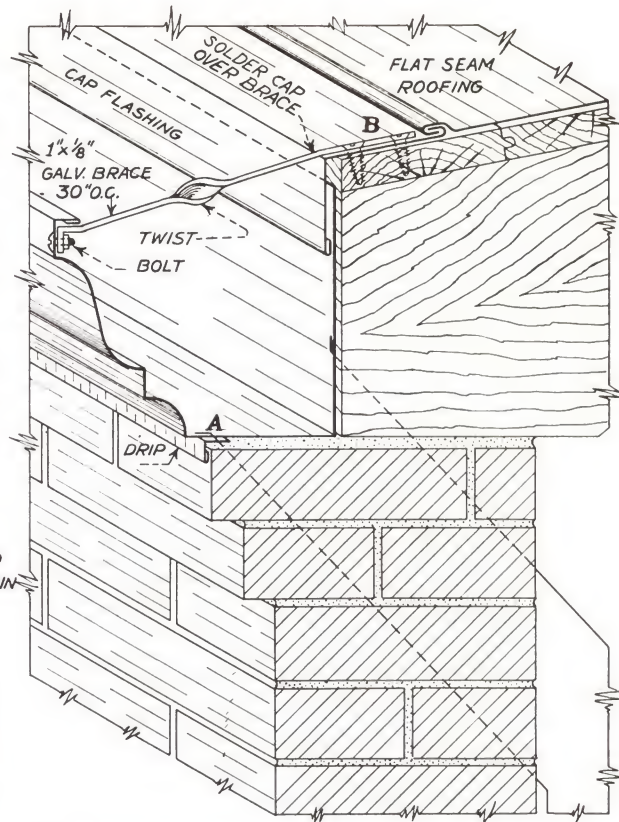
ANOTHER TYPE OF EAVE GUTTER ON BRICK WALL WITH
